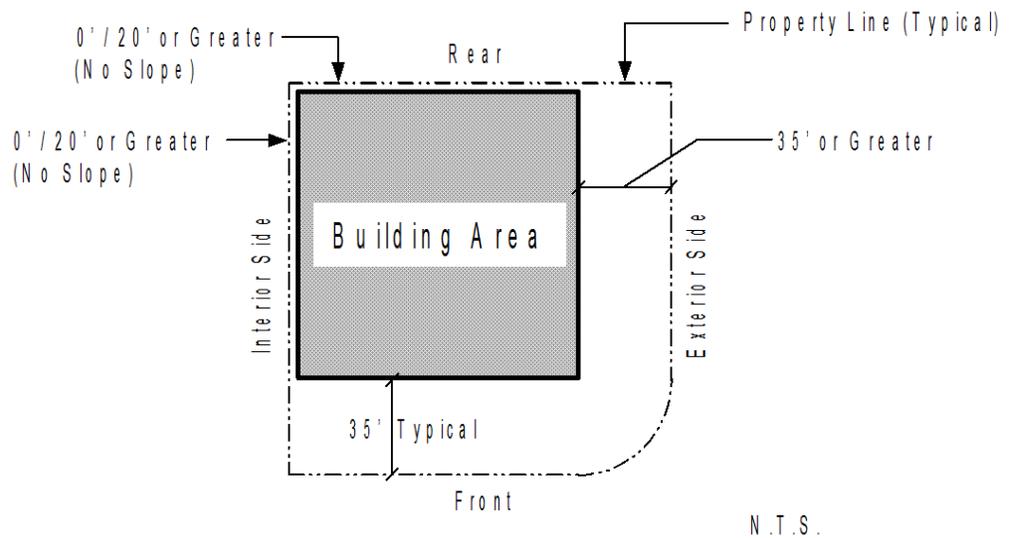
BUILDING SETBACK –CORNER PARCEL
